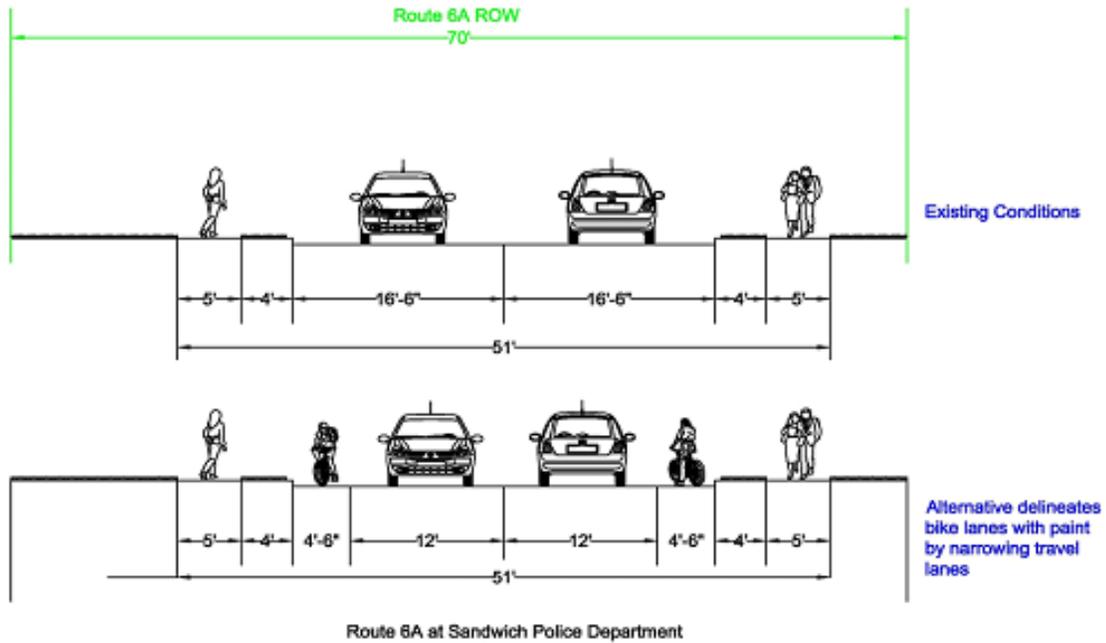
ALIGNMENT F CROSS-SECTIONS
